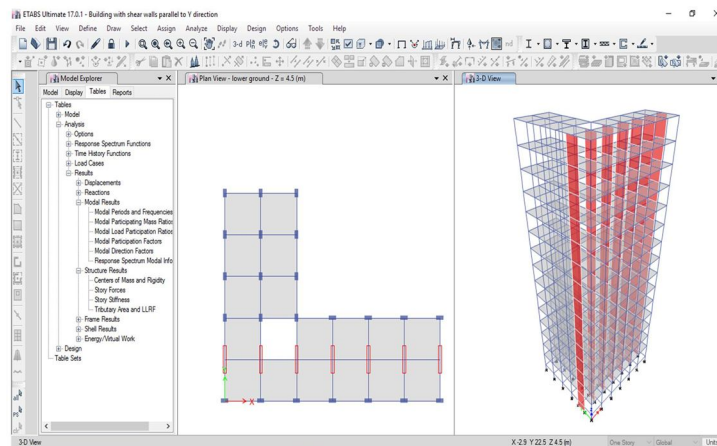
Case 3- Plan and 3-D view of the building (ETAB MODEL)
